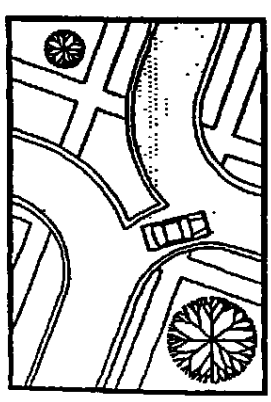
N. Willamette Blvd. at N. Portland Blvd. Looking southwest
